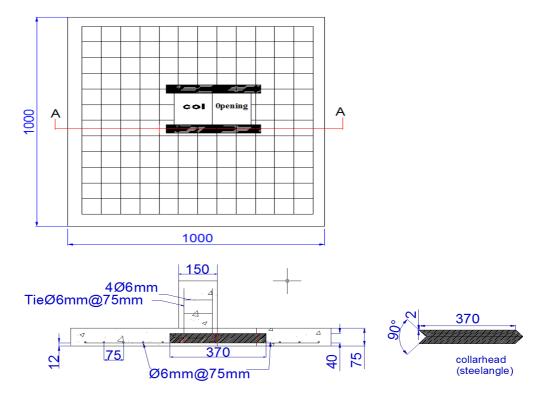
Dimensions and Layout of Slab with Collar Head on both sides of the col NO2
